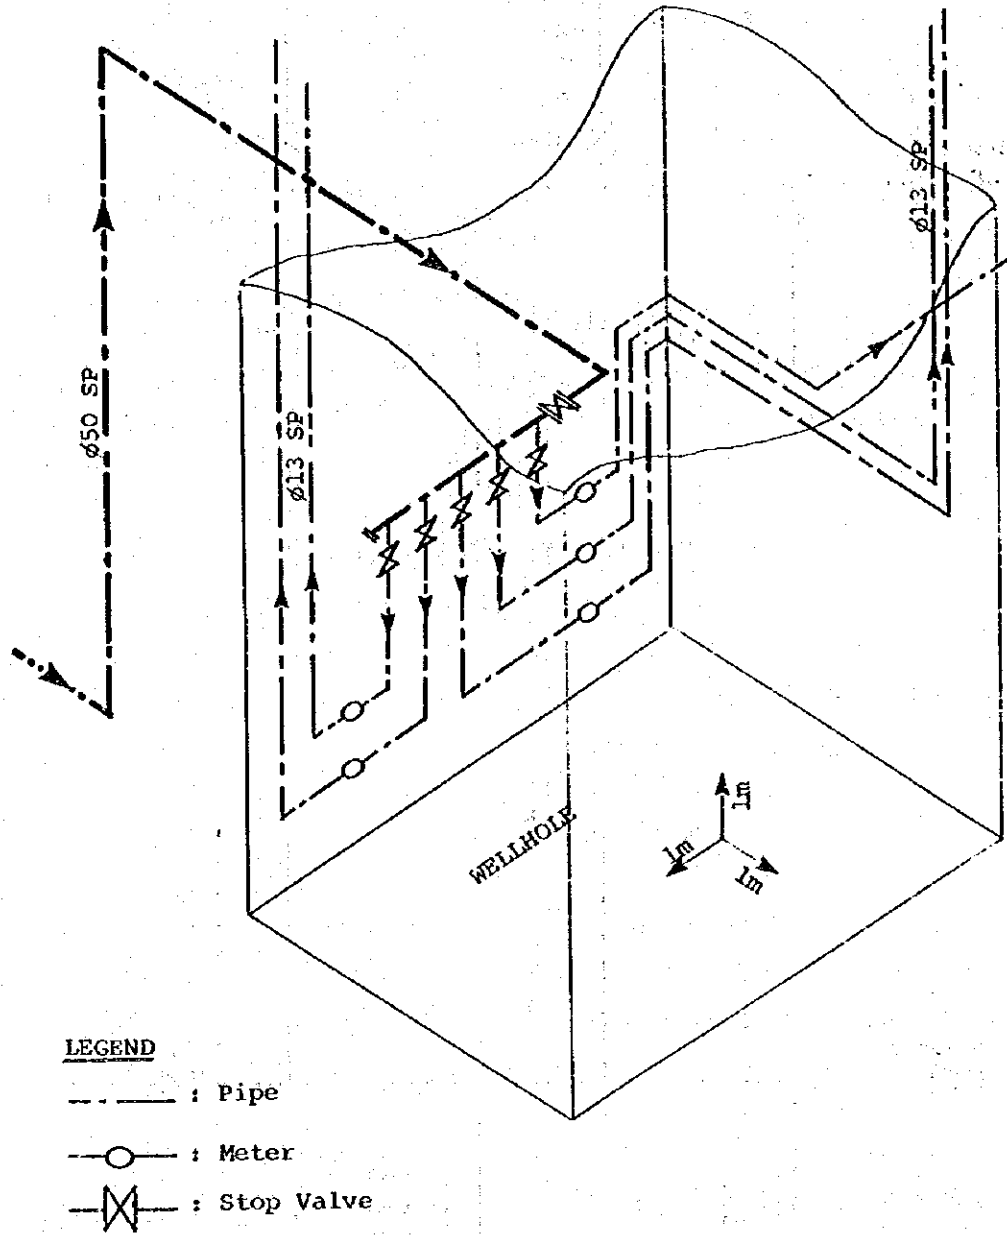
SCHEMATIC RISER SAMPLE IN WELLHOLE OF APATRMENT HOUSE (1)
